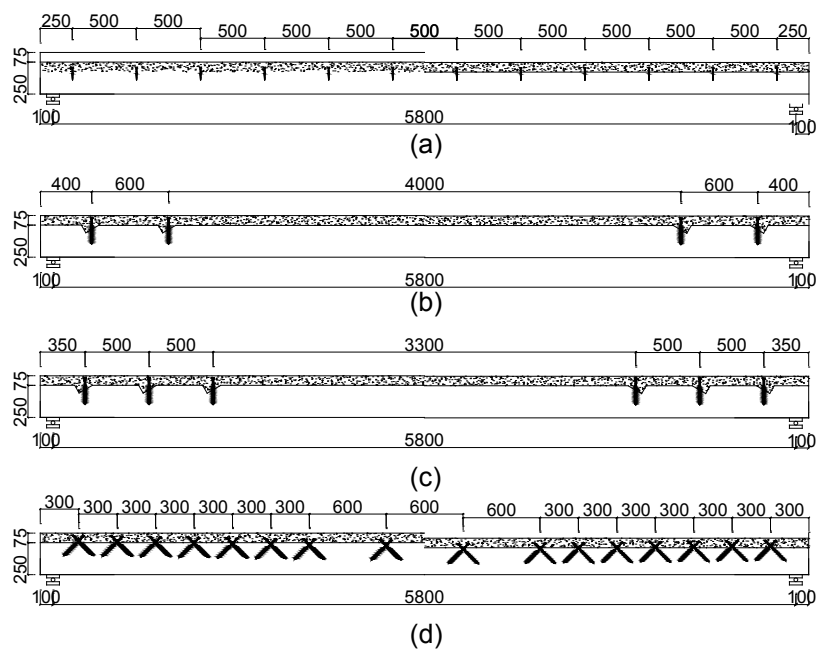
Longitudinal elevation of the TCC beam (measured in mm) (a) B-NS, (b) B-4N, (c) B-6N, & (d) B-SFS
